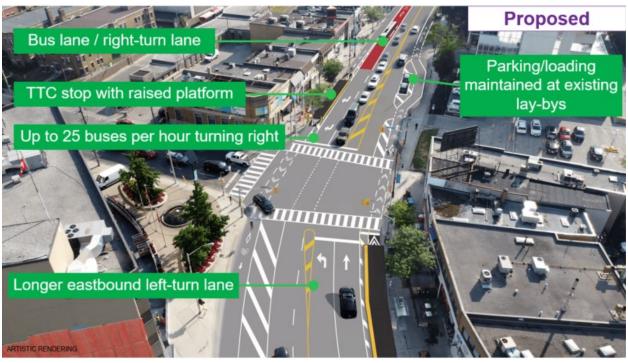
An artist rendering of the intersection of Bloor Street West and Jane Street, where a bus lane is proposed to prioritize transit turns at the intersection.
